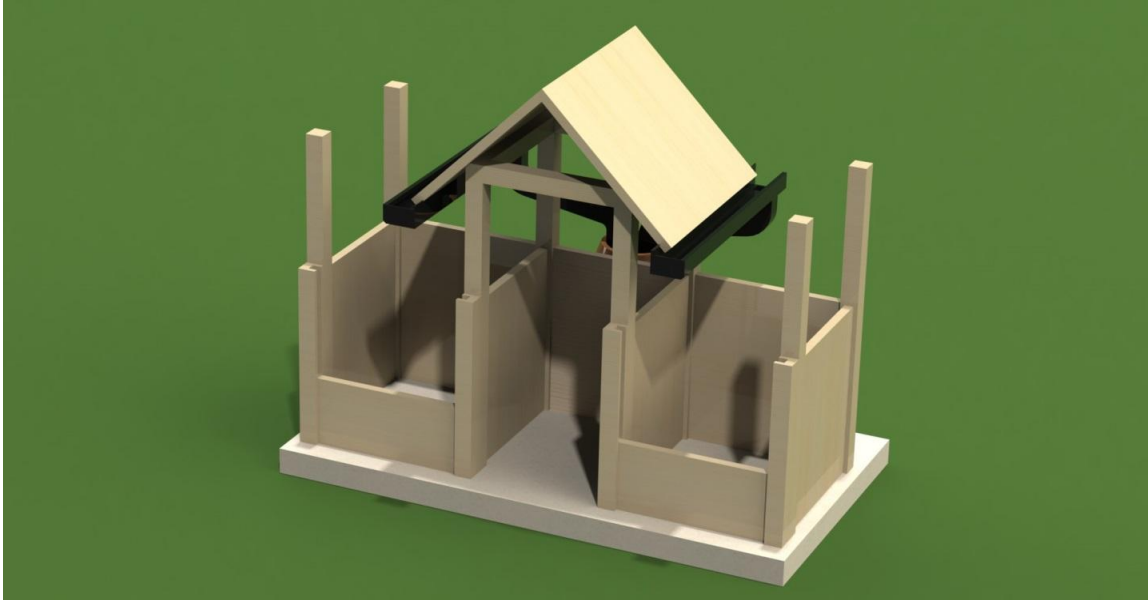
Composting Facility on Concrete Slab (Compost Loading Side)
